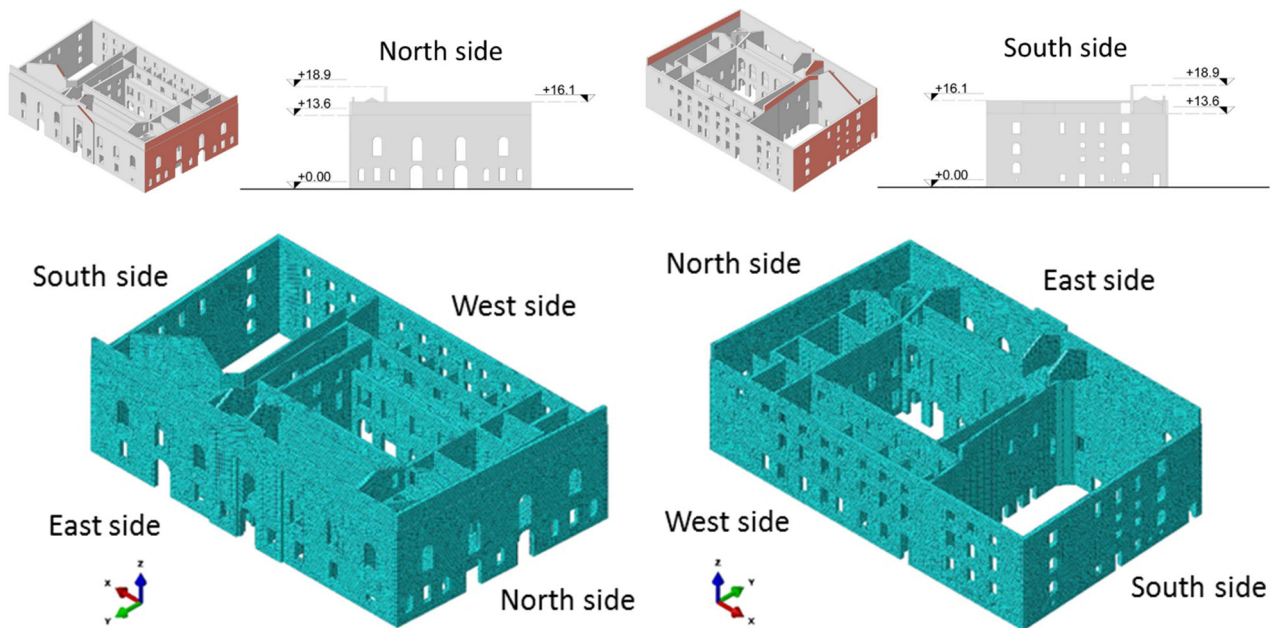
Palazzo dell'Accademia. Geometrical and FE models.
